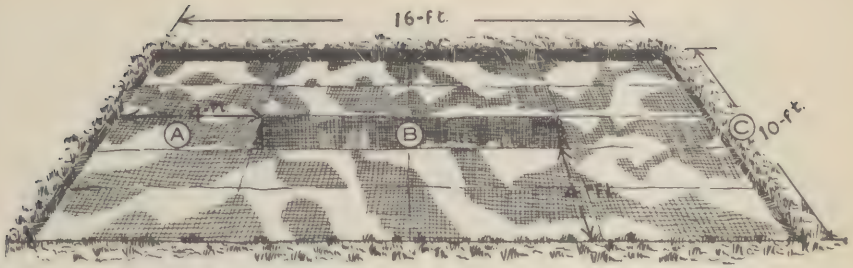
Method of flyproofing latrine pit. A—Oil soaked burlap extending completely around pit. B—Opening of pit. C—Side-wall of excavation in which burlap is placed.
